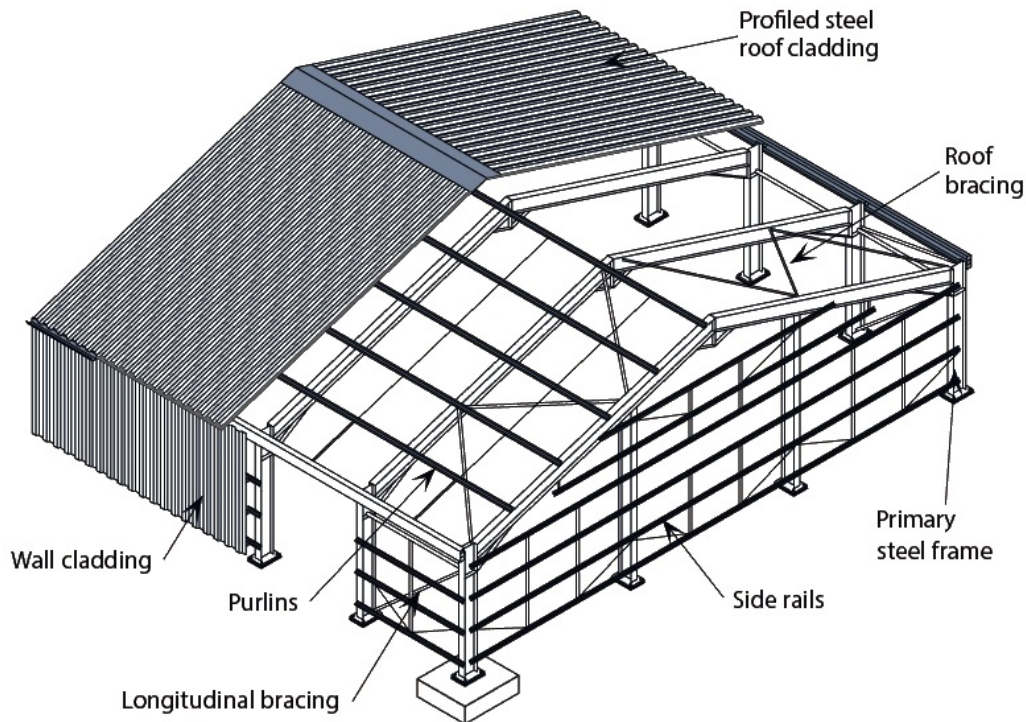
Arrangement of a typical single-storey building, e.g. one-bay portal steel frame
